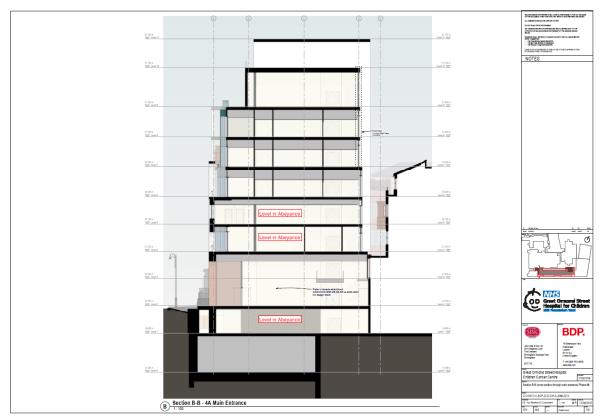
Proposed site layout – Section B-B (cross section through main entrance) Phase 4A (drawing GOSHCCC-BDP-ZZ-ZZ-DR-A-2000-3212)
